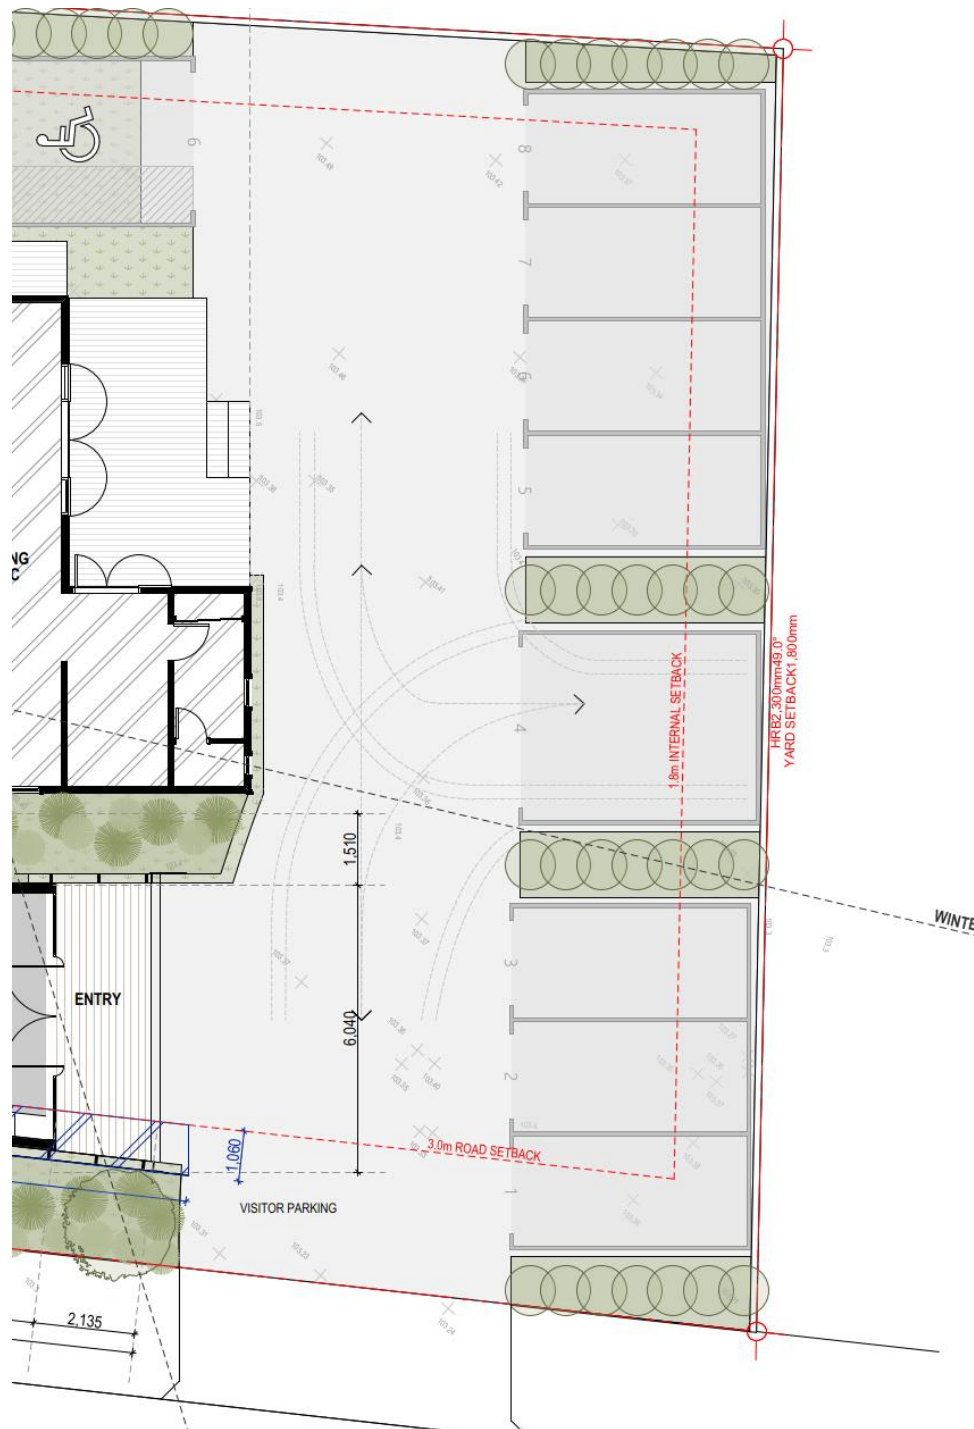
Cropped Site Plan Depicting Proposed Car Parking Along Northeastern Boundary
